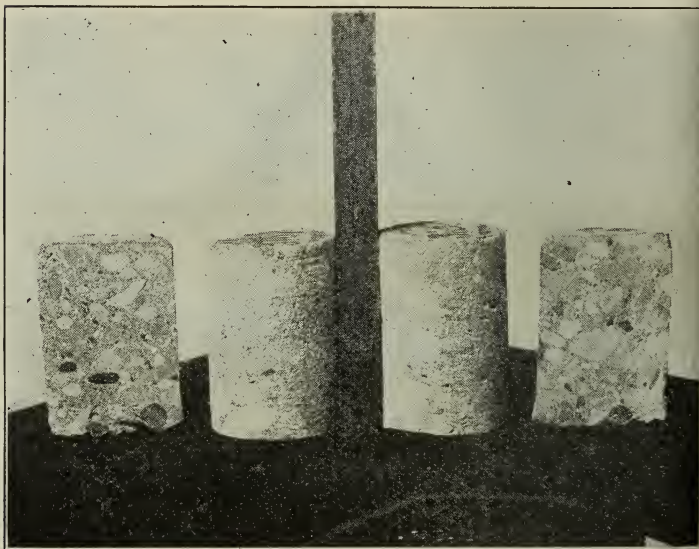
Typical cores taken from pavement for depth and strength determination
